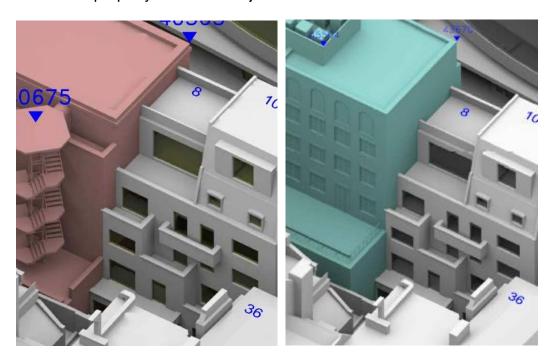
Existing (left) and proposed (right) relationship between site and 8 – 10 Parker Street (GF and 1st floor) and Flats 1-6 (Market House, 12-16) above. 18-24 Parker Street extend off to the right of image
